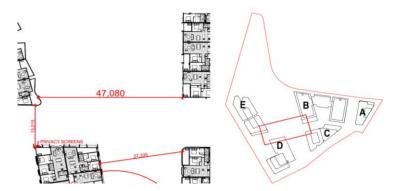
F1.3 Building B-E separation (storeys 1-9) & Key Plan
